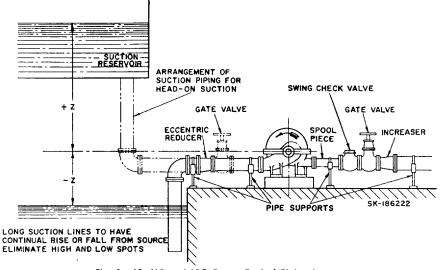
LR, LLR and LRG Pumps Typical Piping Layout
